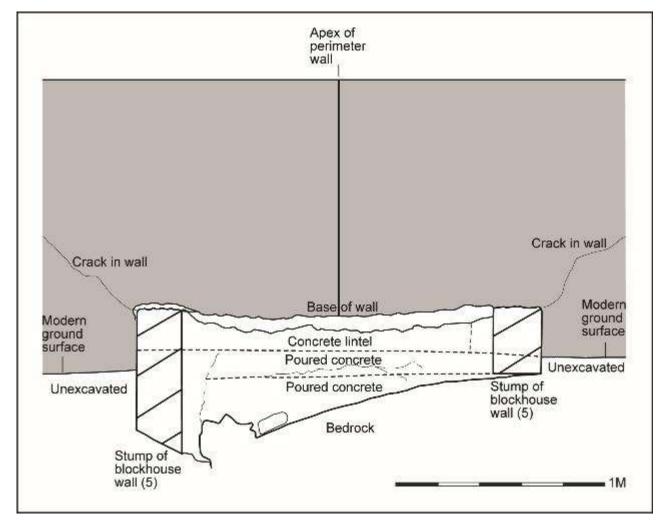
Trench 1A. North-facing section at the southern end of trench showing the stumps of the western and eastern walls of the Blockhouse and the later northern stone perimeter wall of the Fort built over these. Between the blockhouse walls layers of poured concrete and a concrete lintel were used to level up the uneven bedrock and provide a firm base for the perimeter wall.
